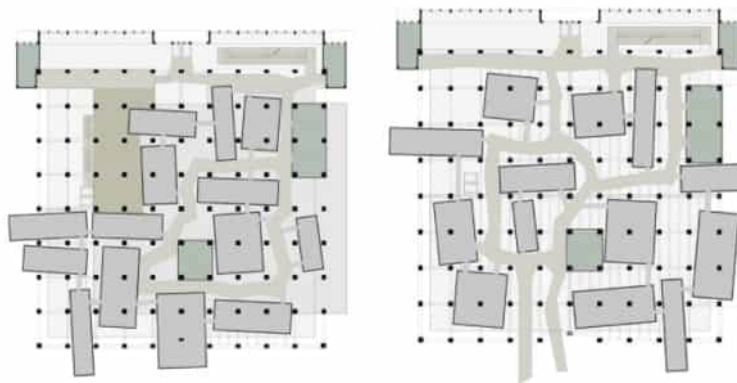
Floor Plans of Container Gallery Areas Placed in Istanbul Warehouse 5 [26].
